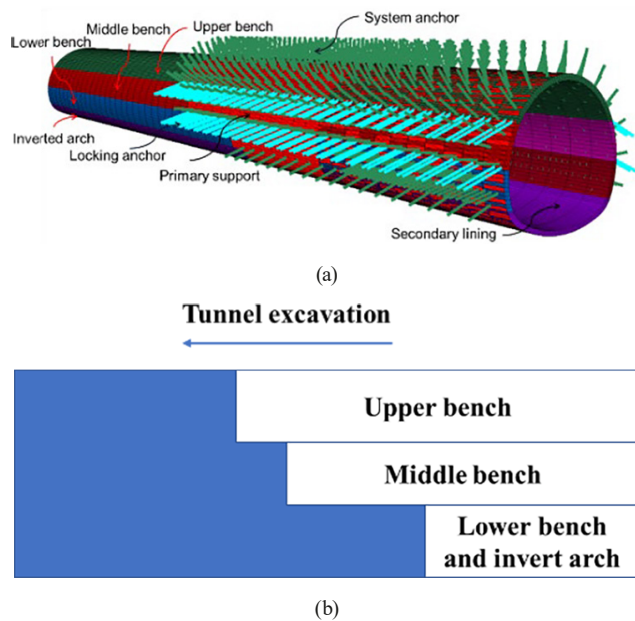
(a) The partial numerical model of tunnel excavation and support, (b) Longitudinal schematic of the tunnel excavation
